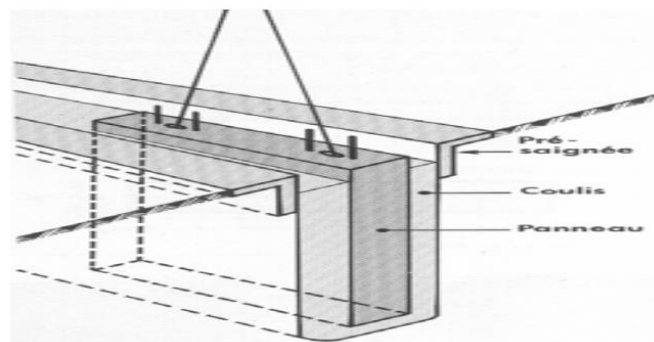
Installation principle of a prefabricated diaphragm wall
